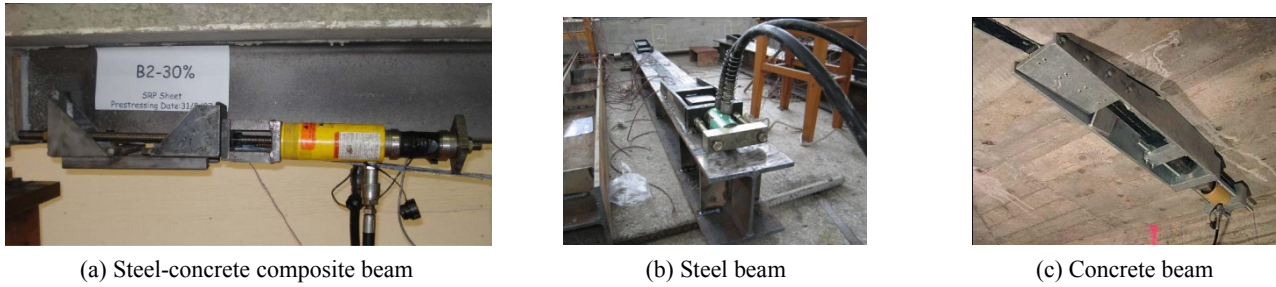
Anchorage systems for strengthening with prestressed FRP laminates
